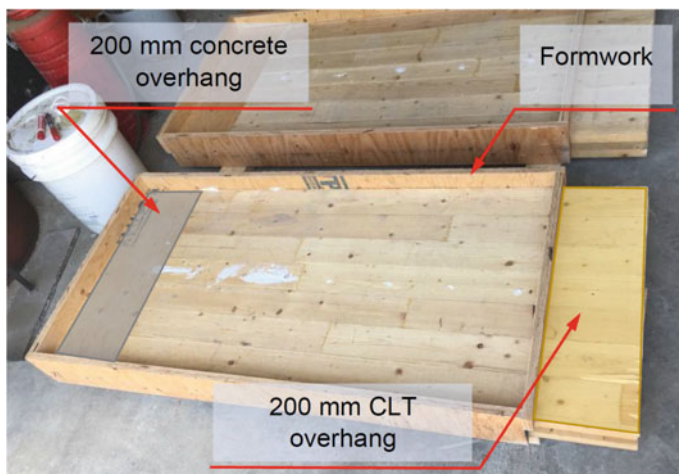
A CLT panel with concrete formwork installed to allow concrete casting
